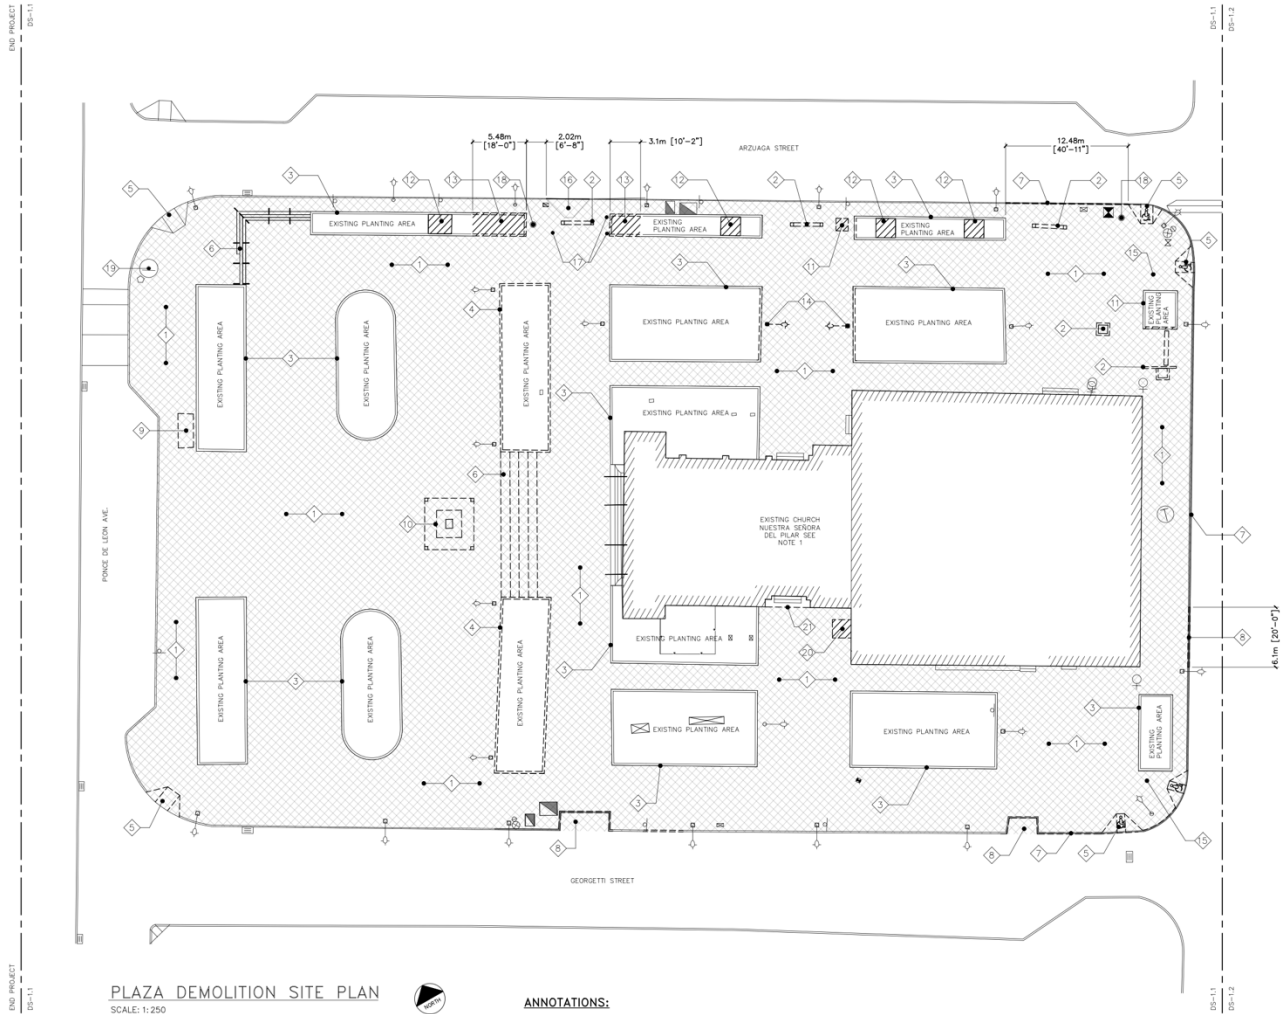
Demolition site plan for Plaza del Pilar (Source: Drawing DS-1.1, Hernández-Bauzá PSC Architects, 2024).
